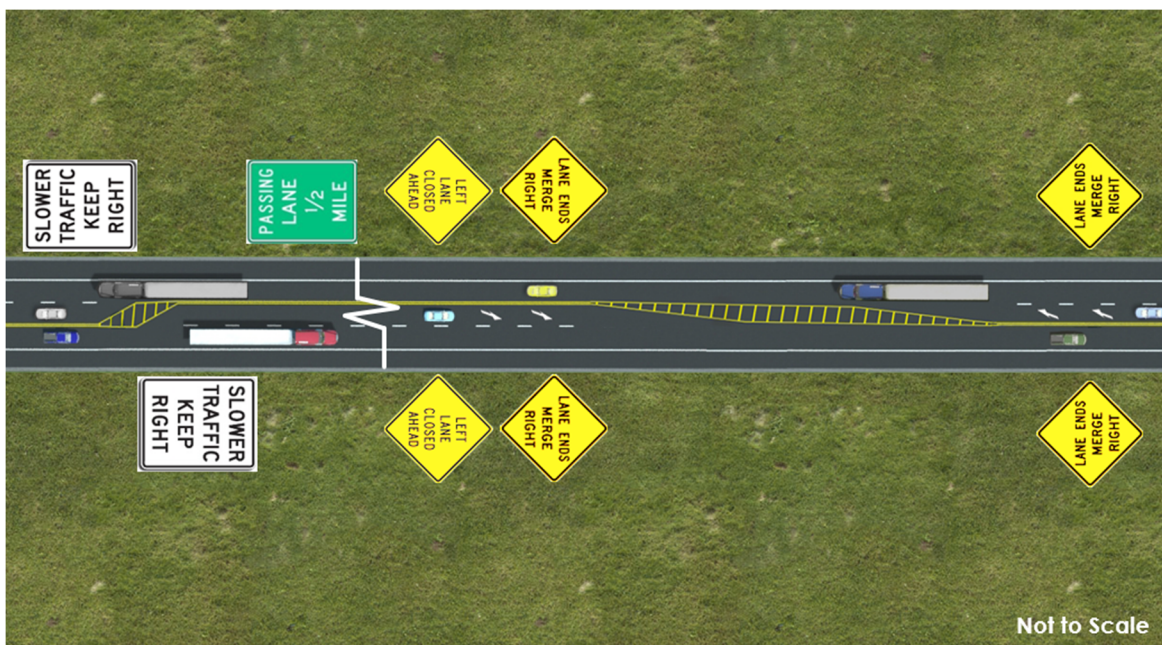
Potential 2+1 Roadway Signing and Striping Layout
